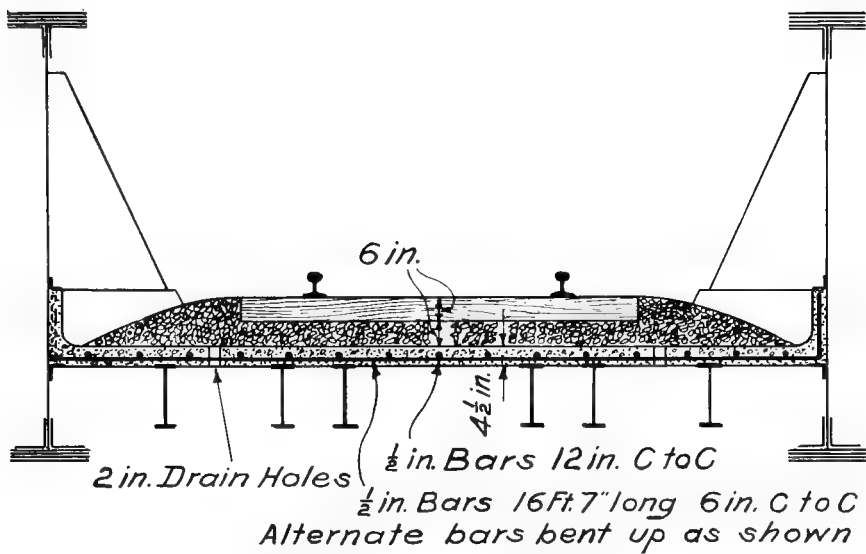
CROSS SECTION, THROUGH-GIRDER BRIDGE FLOOR, C., B. & Q. R. R.
